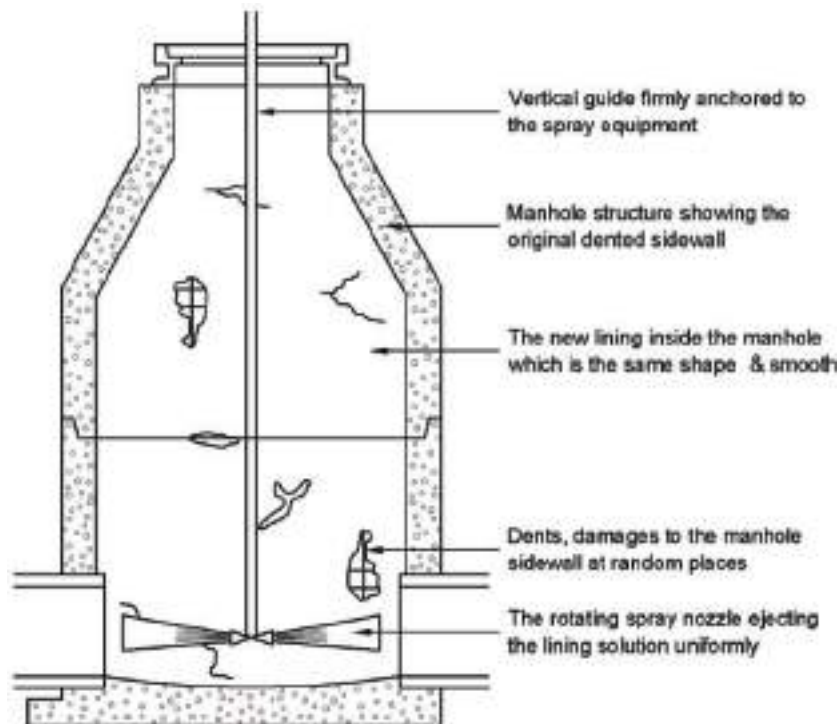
Depiction on in-situ sewer manhole lining (Spray equipment not shown)
